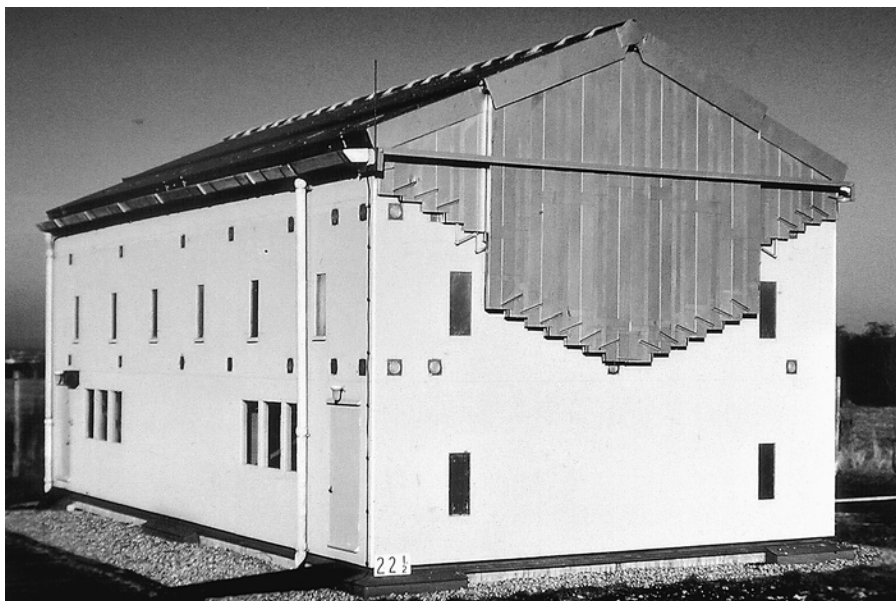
Aylesbury Experimental Building (United Kingdom 1970–75).
